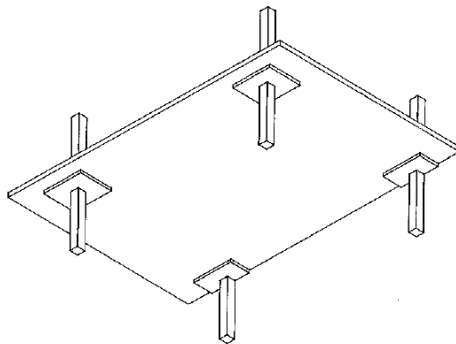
VIEW OF FLAT SLAB WITH DROP PANELS
